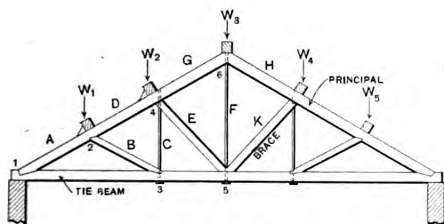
A Triangular Truss for Spans Greater than 36 to 40 Feet.
